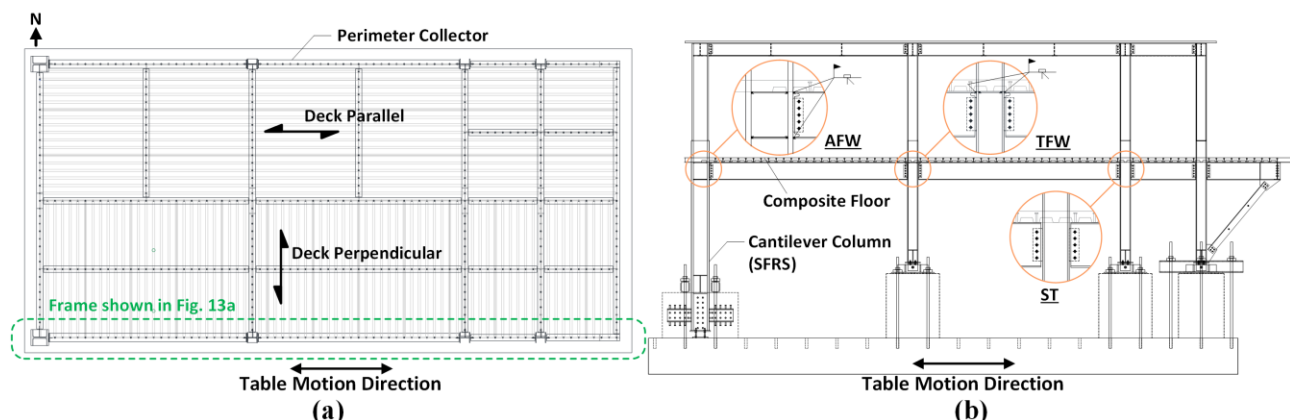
NHERI@UCSD Shake Table Specimen: (a) Plan View (Phase 1); (b) Elevation (Phase 2).
